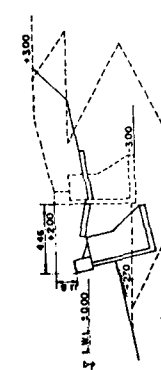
Damage to L-shaped block quaywall at Shimizu port (Kitaizu earthquake)
